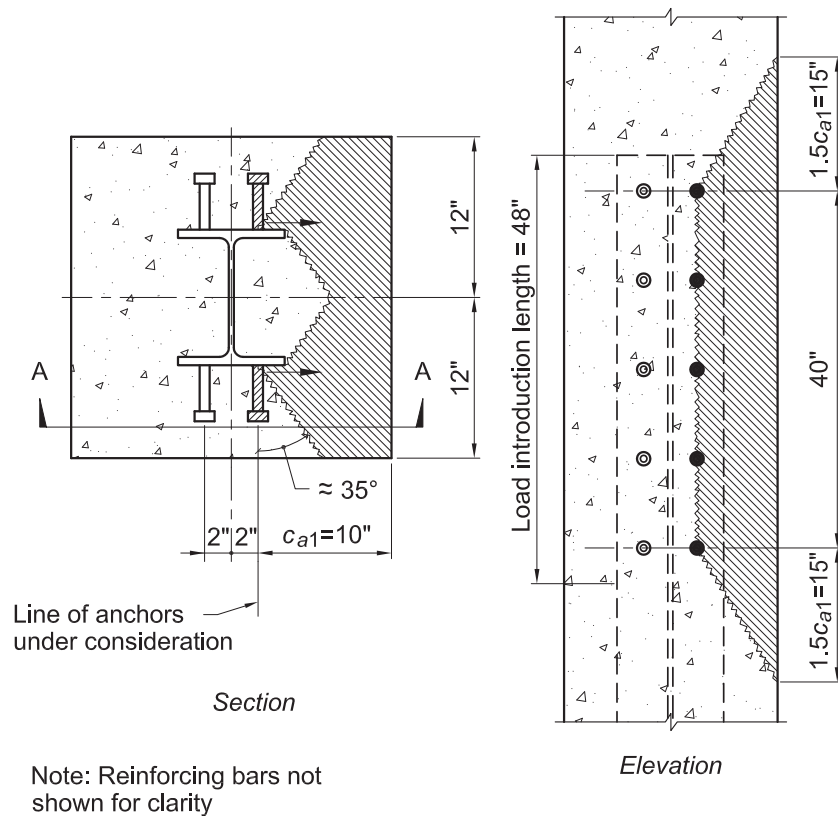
Concrete breakout check for shear force parallel to an edge.
